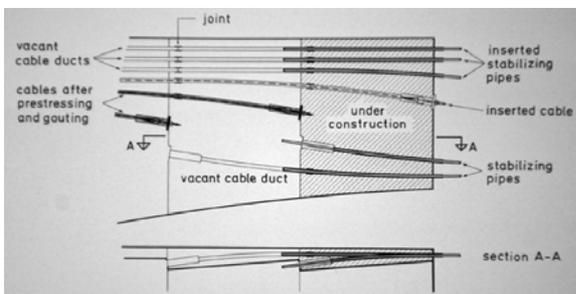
Diagram of Polensky & Zöllner's system to maintain the geometry of tendon ducts while concrete was being placed using shaped bars. This system is used in cantilever construction to eliminate couplers. (Wittfoht):
